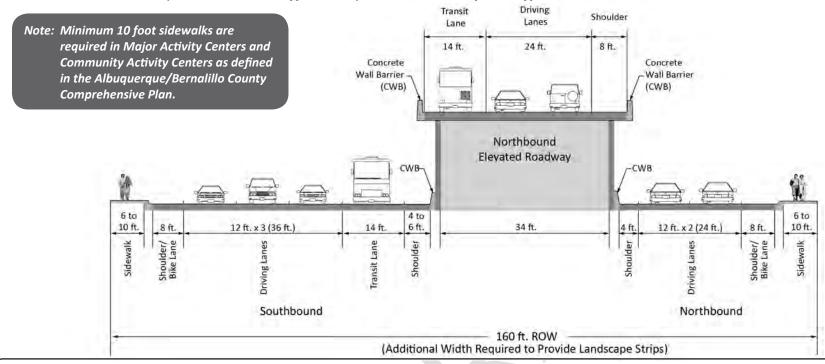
Typical Section of Conceptual Grade-Separated, Elevated Roadway on Coors Boulevard (NM 45) from Quail Road through Sequoia Road
